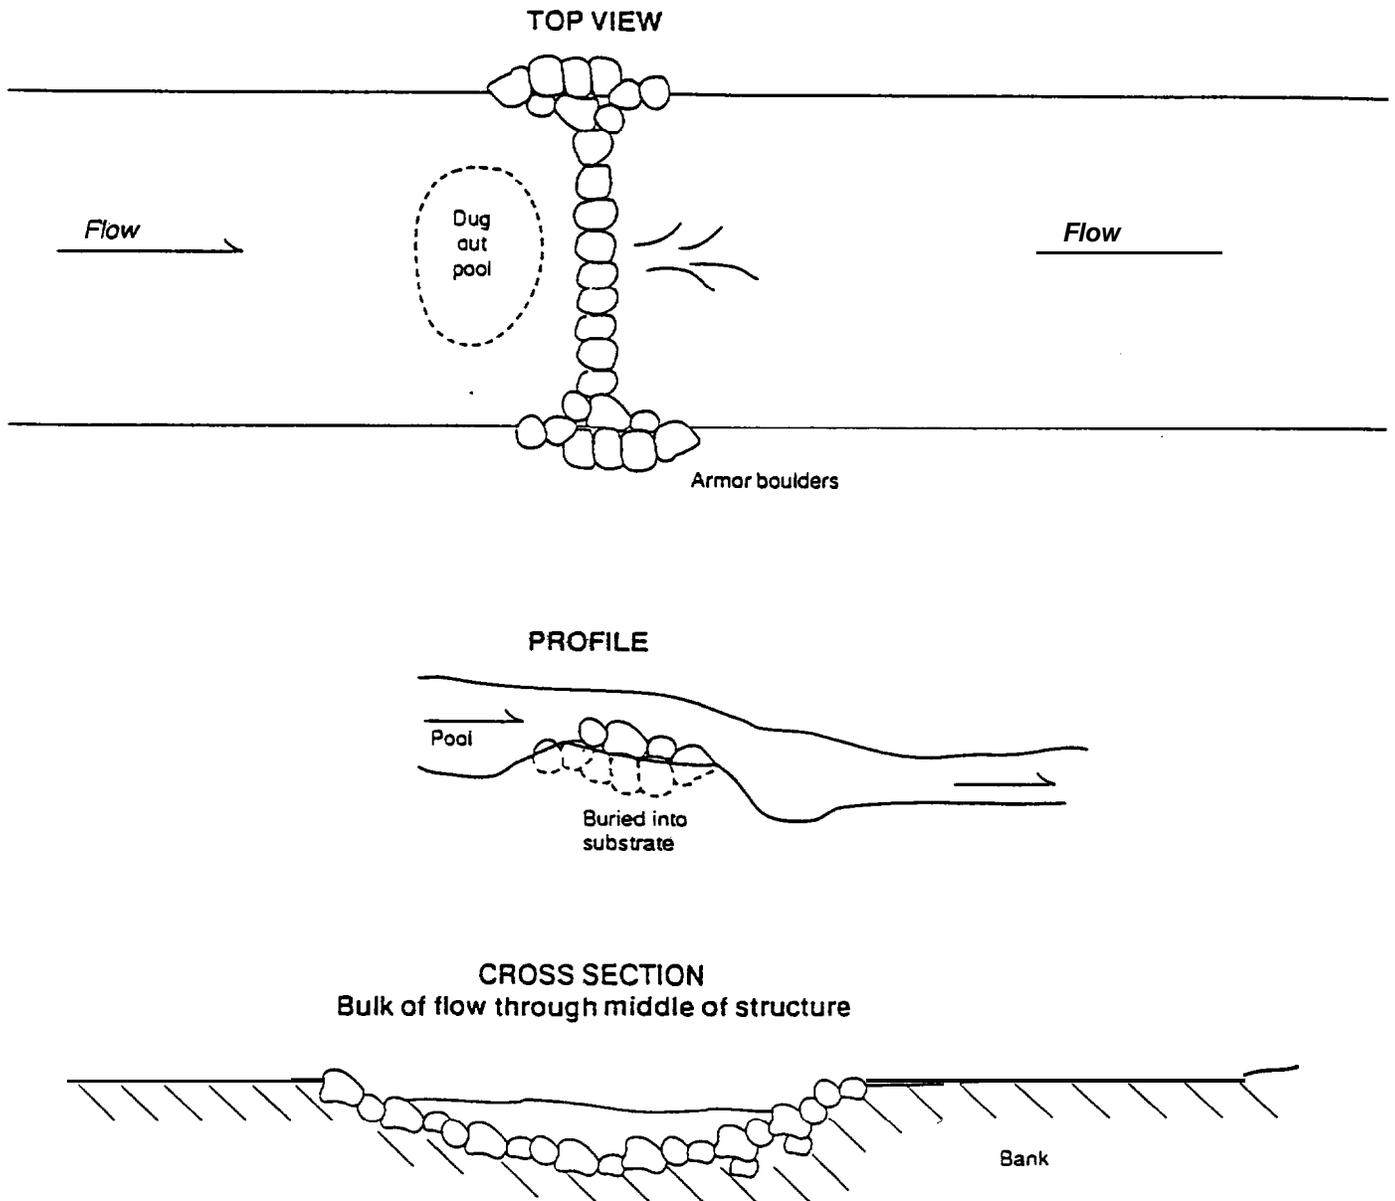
Plan view of rock structures used in the Potters Pond enhancement project.
